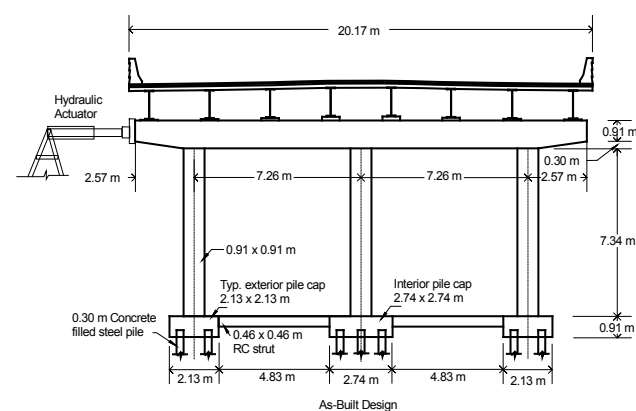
Dimensions and test layout of typical bridge bent at South Temple Bridge in Salt Lake City
